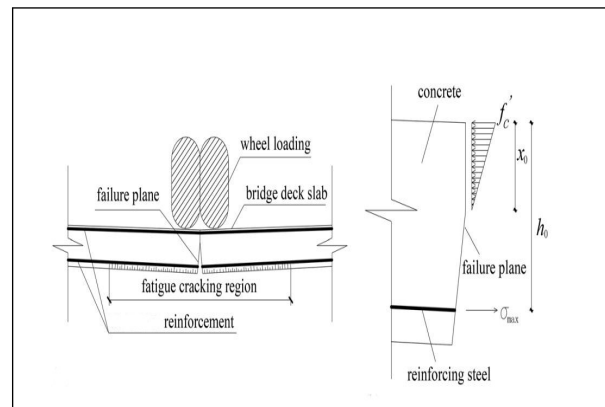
a) Failure mode of reinforcement bar b) Stress distribution on failure plane
